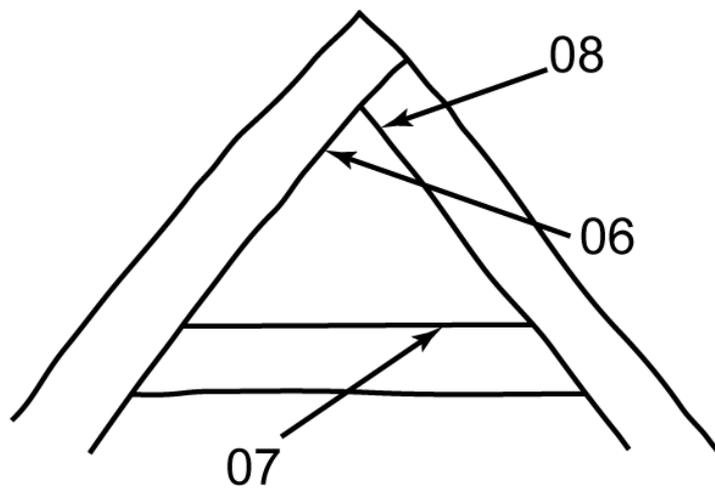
Cross-wing, truss 3, east face, showing the location of samples 06–08
